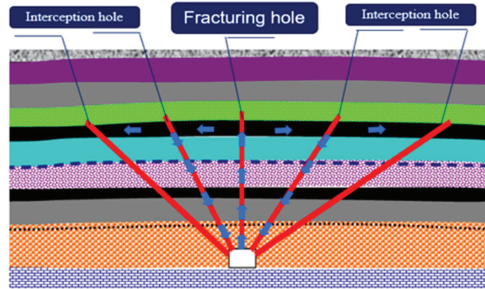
Fracturing drilling design plan of 14201 working surface strip upper roadway test area.
